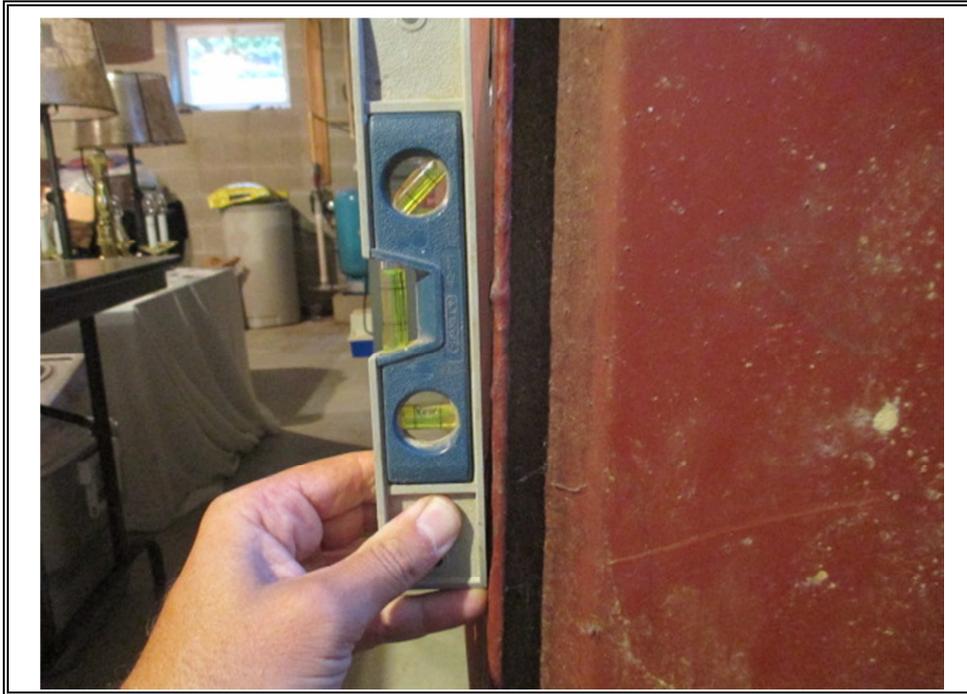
The tank is plumb east to west but leaning slightly north toward the basement wall.
